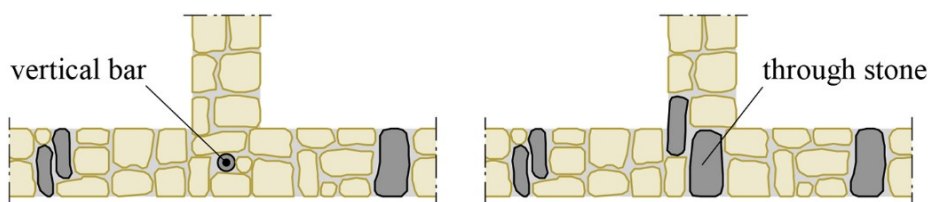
Conflicting rubble stone masonry details of a) T-section with vertical steel bar and b) T-section with through-stones (courtesy of SSF).
